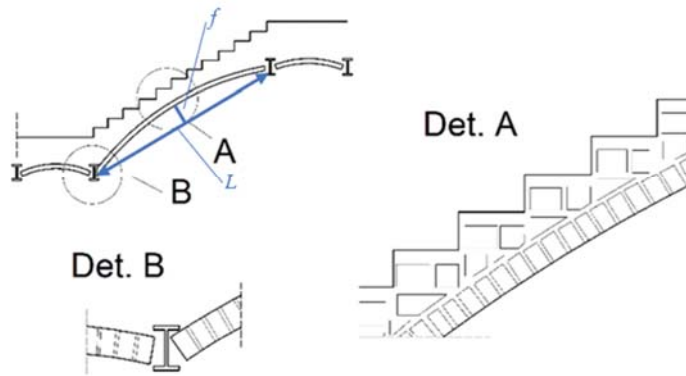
Masonry stairs with segmental vault and arched staircase slab, based on [1].
